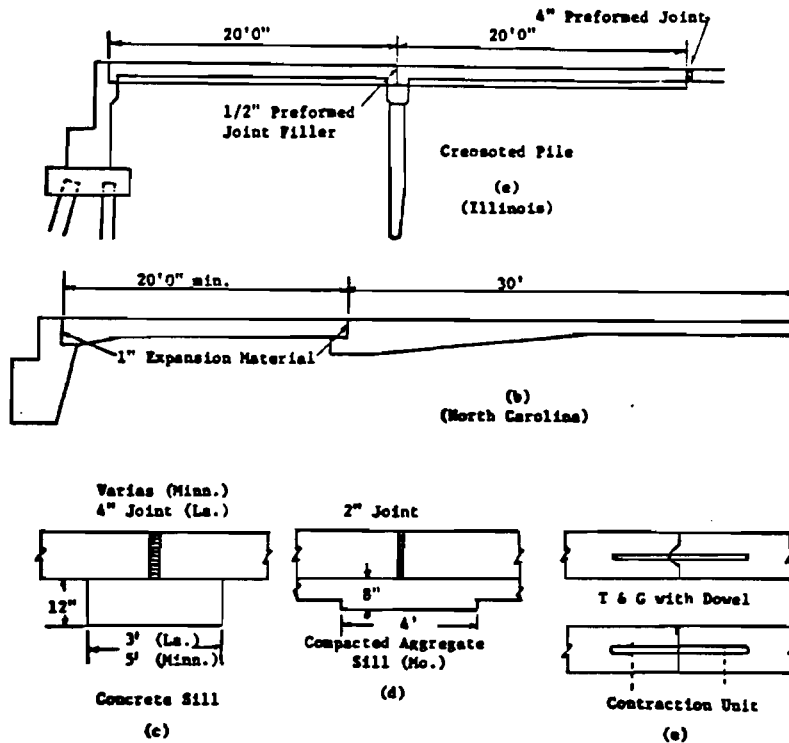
Joints used between roadway pavement and approach slabs (from Ref 2).
